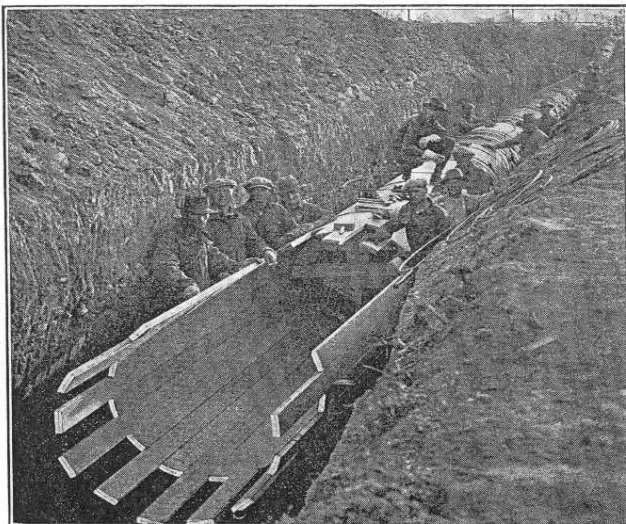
Erection of wood-stave pipe line. (Courtesy of Redwood Manufacturers Company.)
